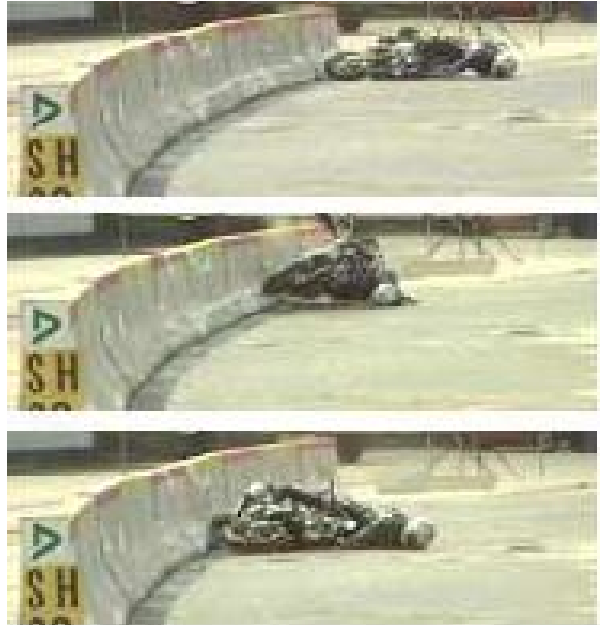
The motorcycle impacts the concrete barrier protection system in a sliding position [6]
